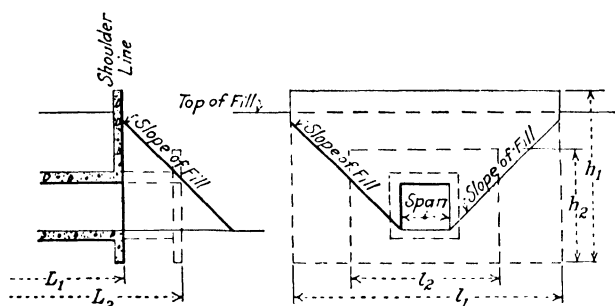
Relation of length of barrel to height and length of head wall.
